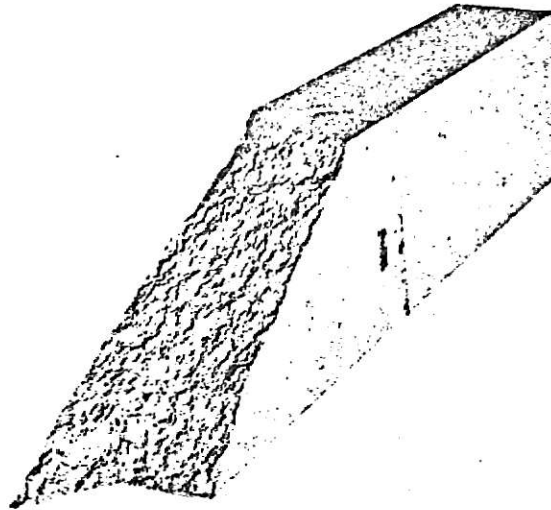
FAILURE SURFACE OF 10x15-in. BEAM(A1)
